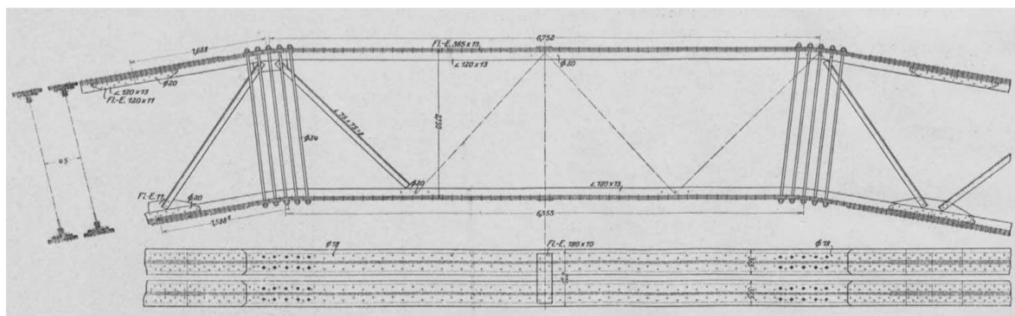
The structure of the lattice girders of the bottom ring, [3].
